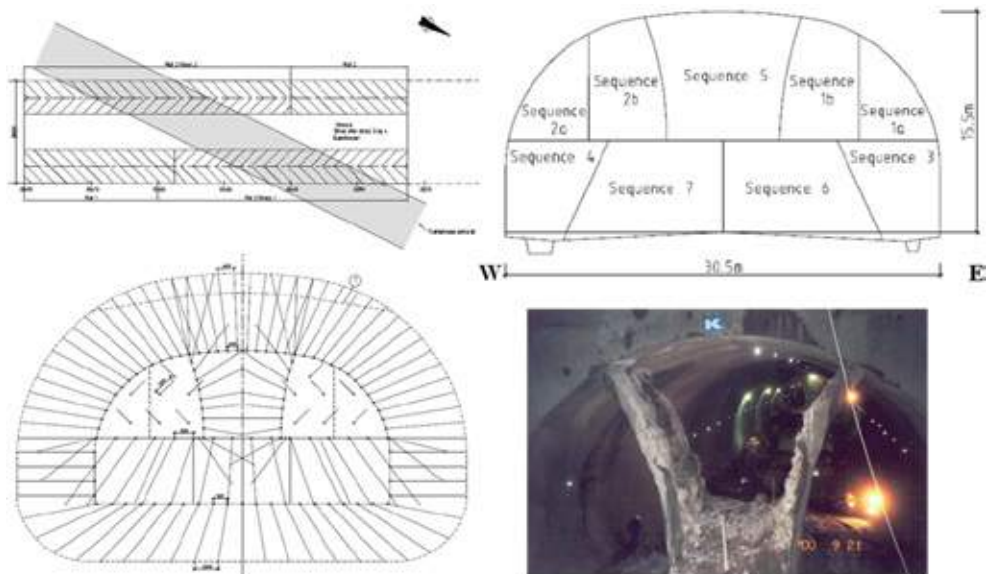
Excavation and grouting in the major fault. Upper left: tunnel driving of the gallery seen from above; upper right: the whole cross section is divided in nine excavation sequences; lower left: grouting holes drilled from the gallery and the tunnel floor; lower right: example of use of temporary, sprayed, lattice girders.
